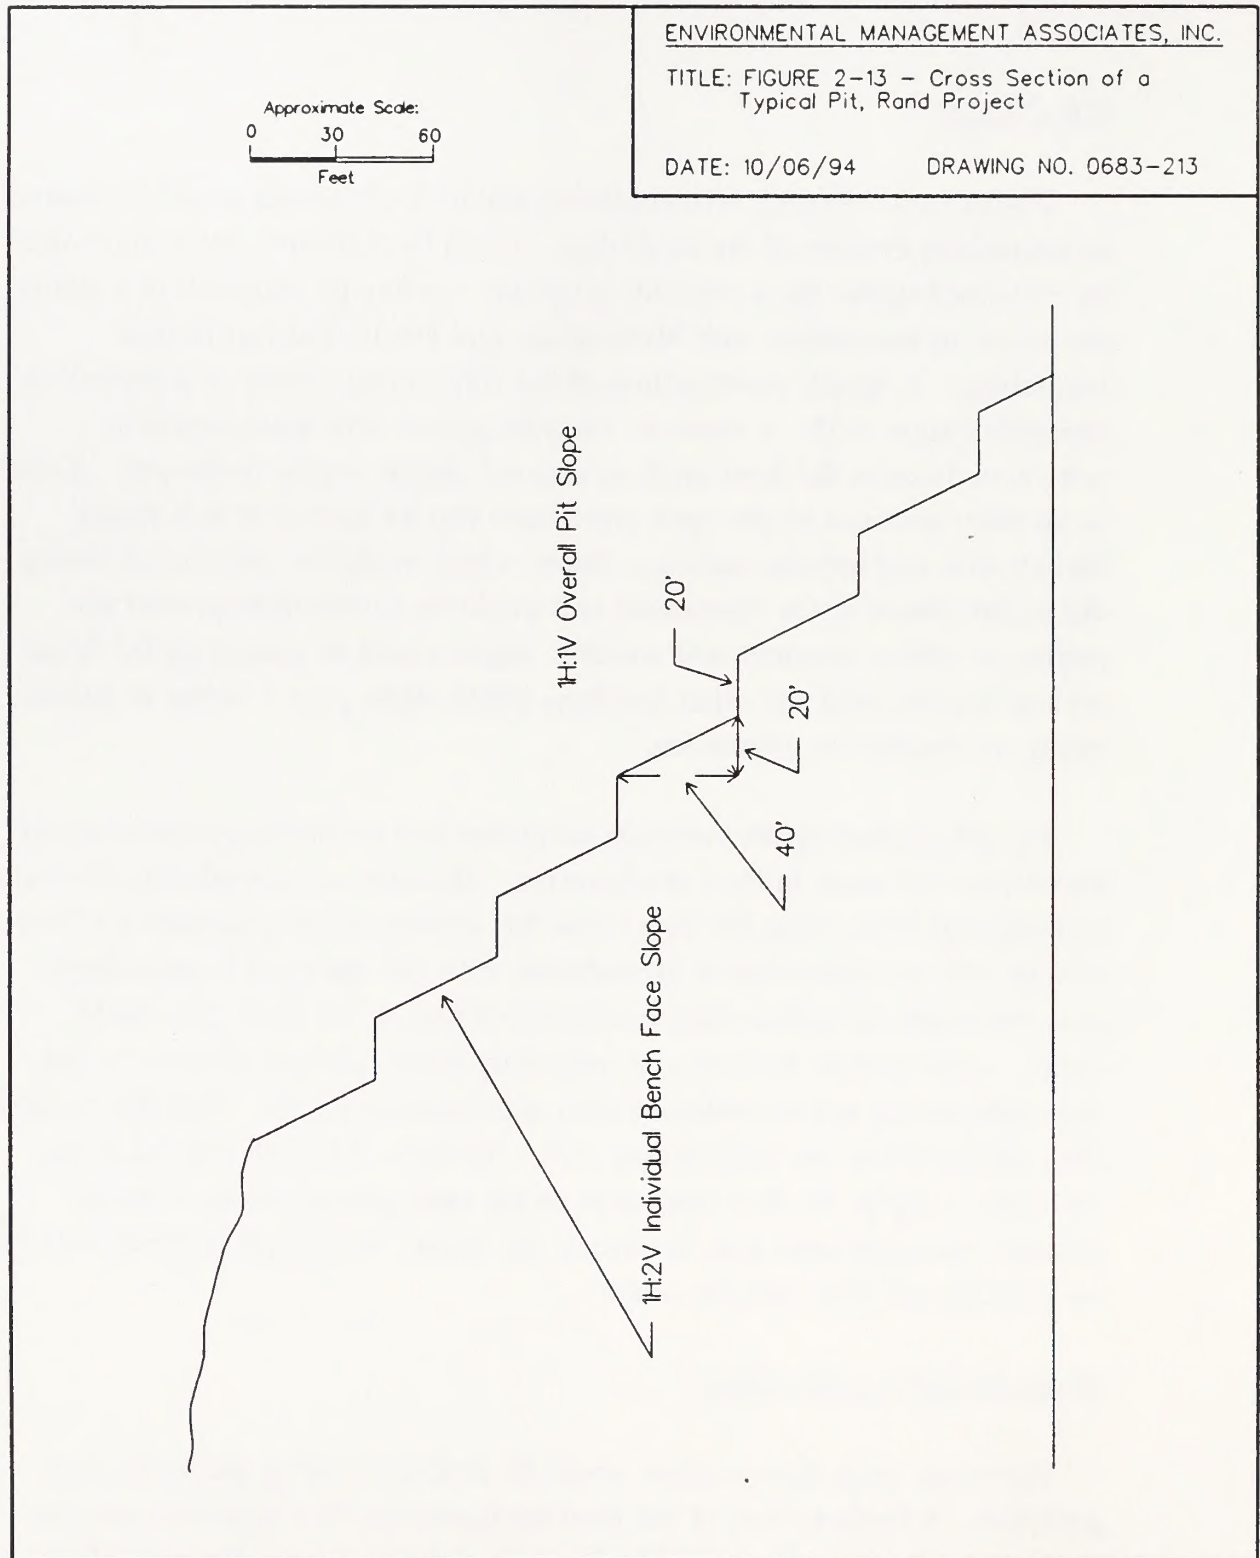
Cross Section of a Typical Pit, Rand Project
